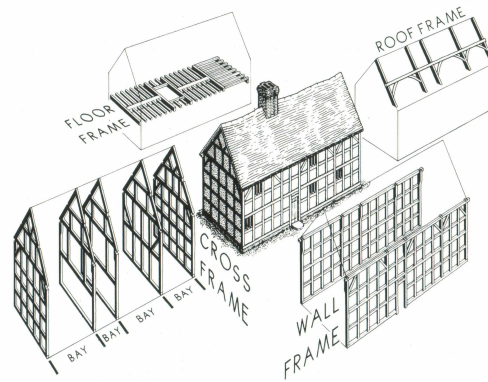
Prefabricated medieval timber-framed building (after Harris [33])
